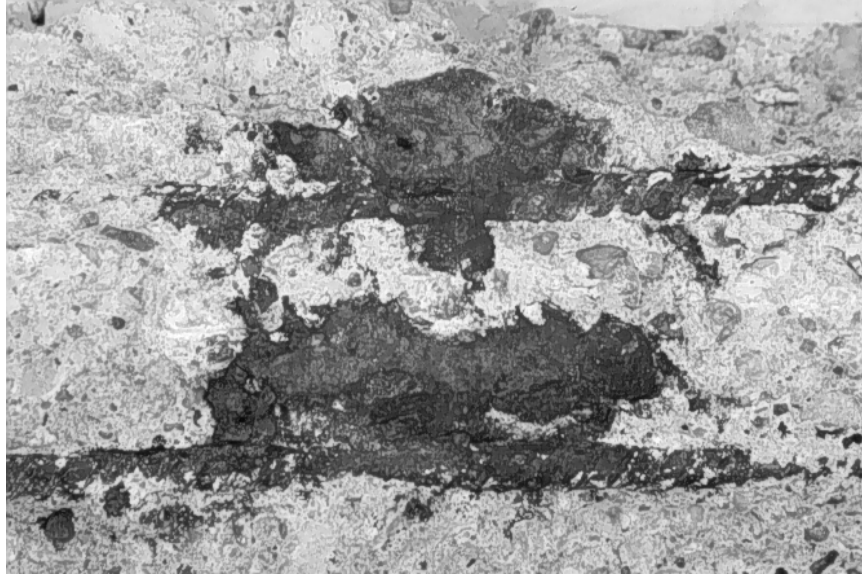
Patching material observed on stirrup imprint in concrete.
